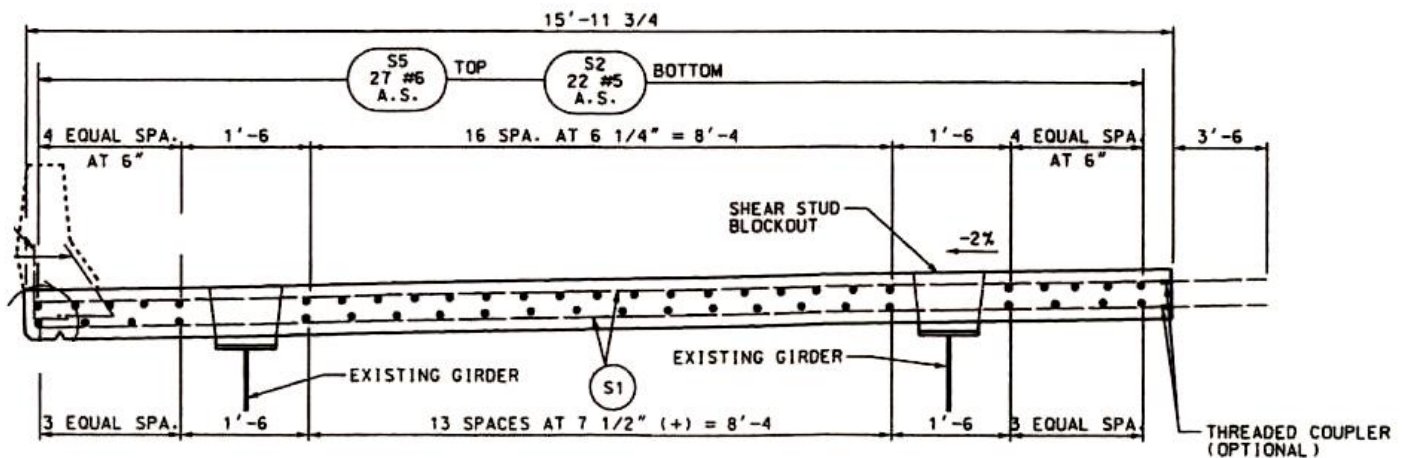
Cross-section elevation of a typical precast panel
